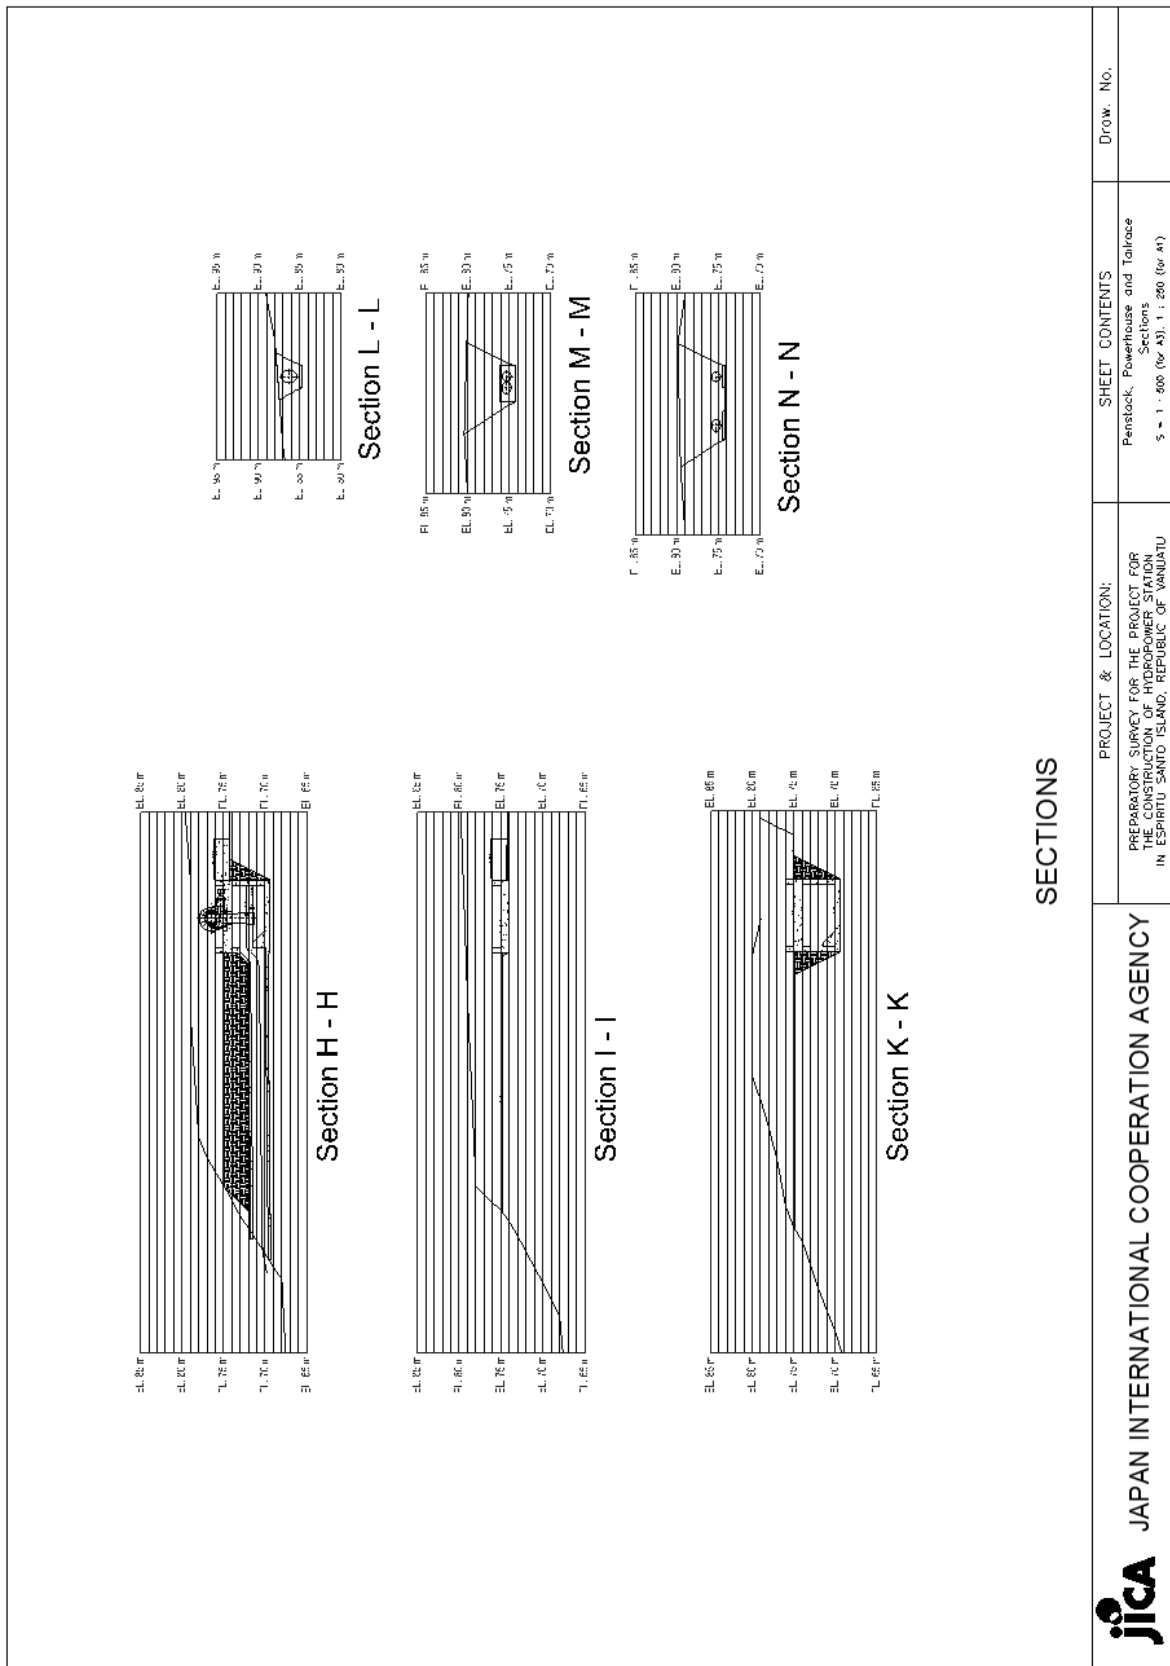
Penstock, Powerhouse and Tailrace (1/2)
